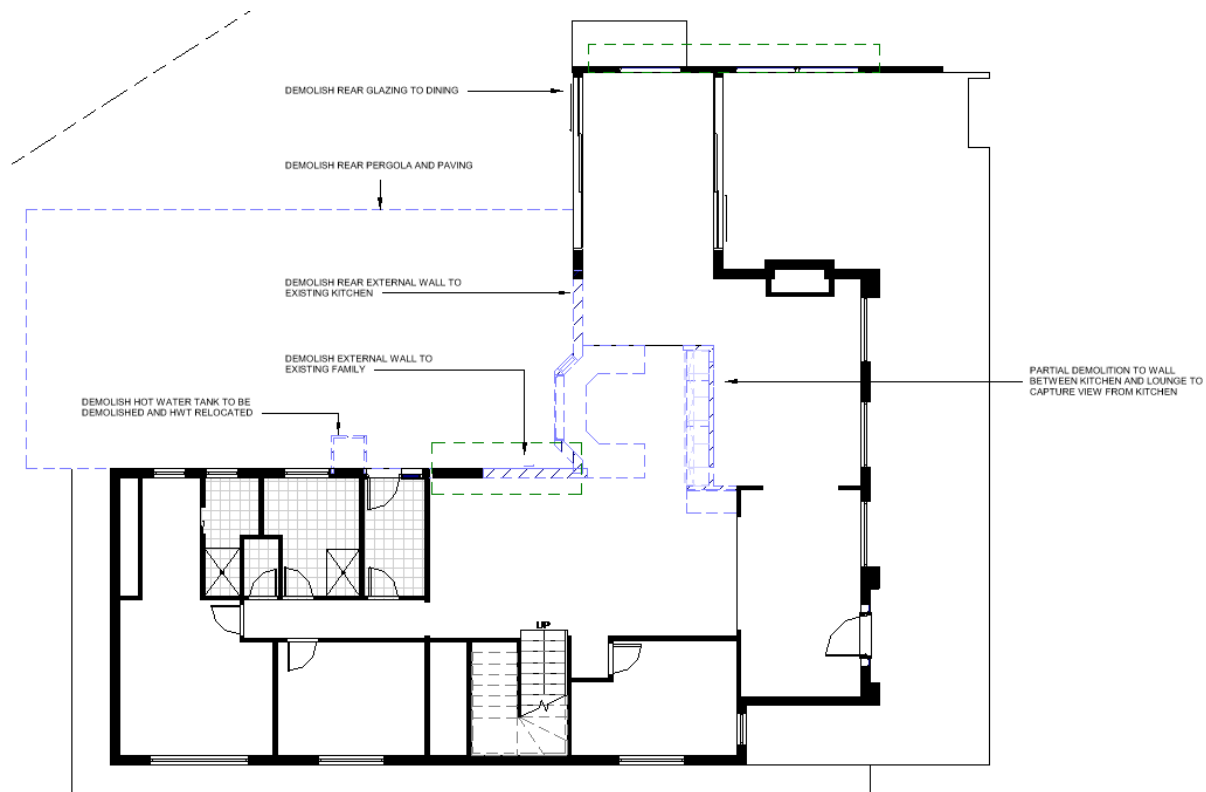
Demolition Plan (source Astute Architectural Drafting)
